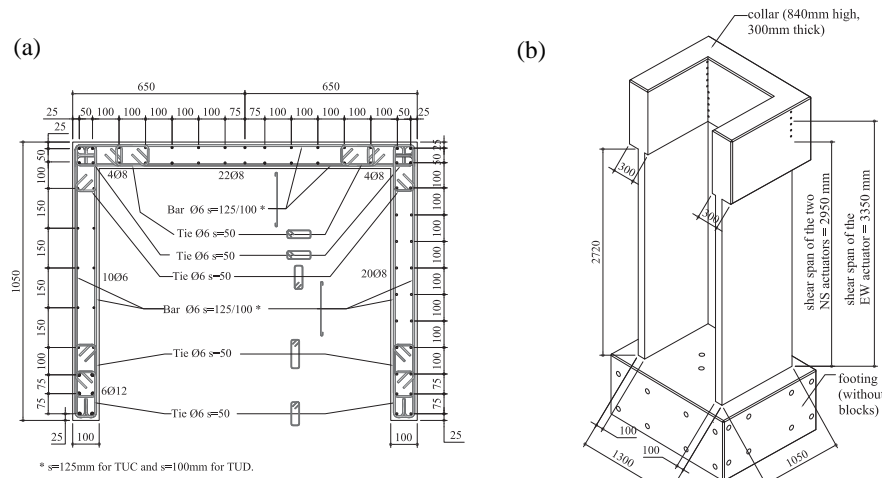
TUC and TUD geometry: cross-section (a) and elevation (b)
